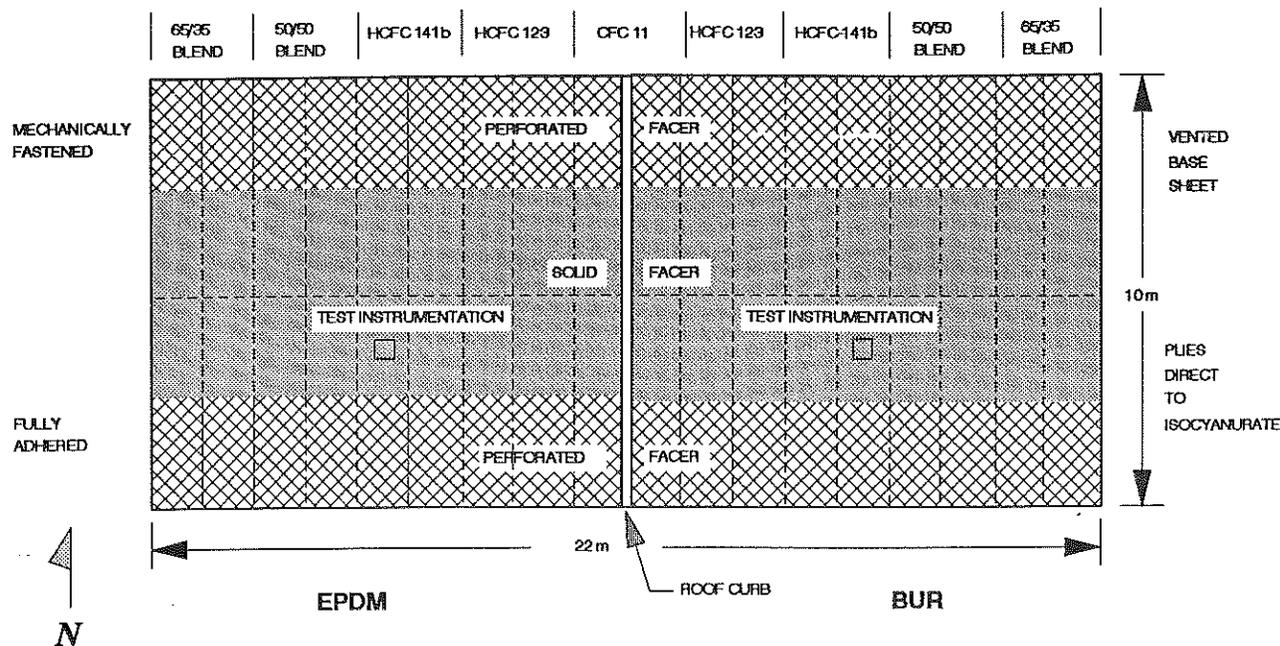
ESRA roof plan details the layout of the insulation boards and the location of the test specimens.
